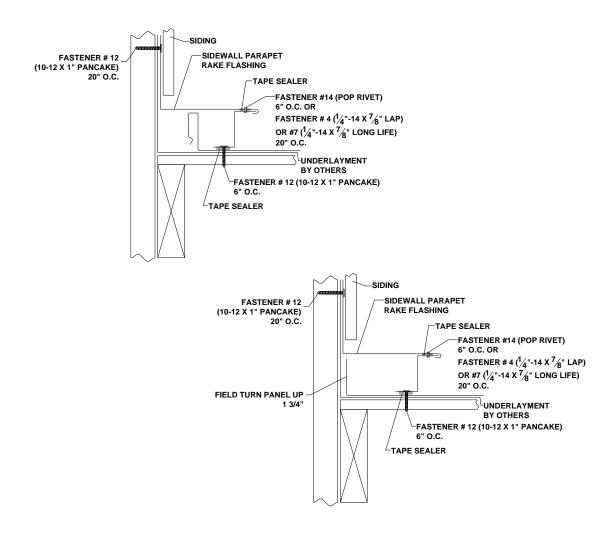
Sidewall/Parapet Fixed Rake Flashing Detail
